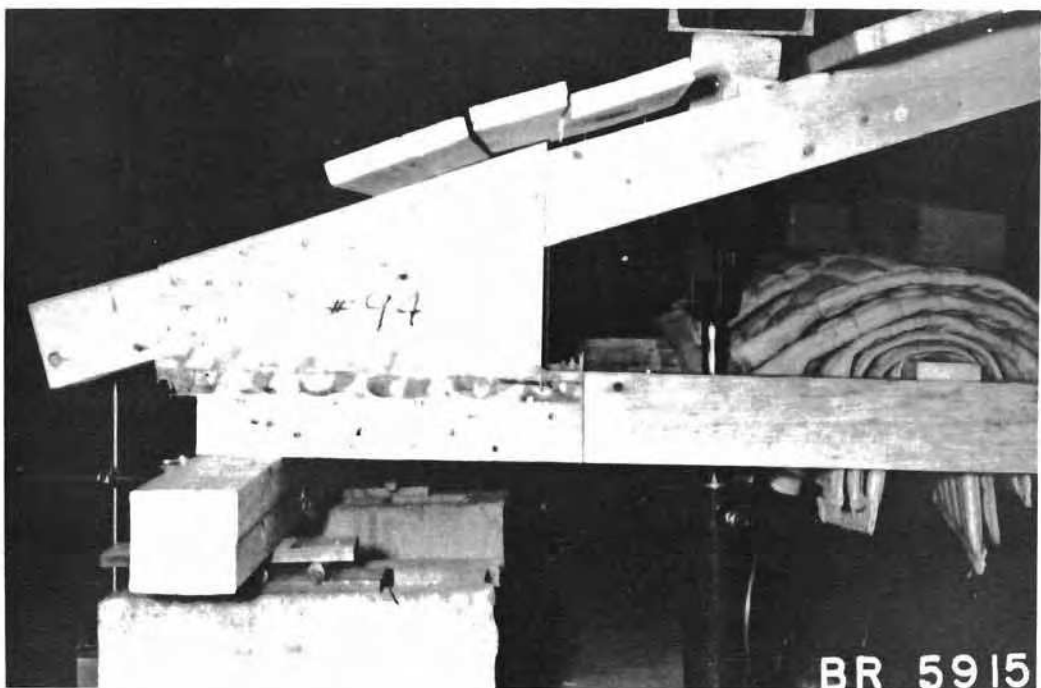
Shear failure in the heel gusset plates in Test No. 94.
